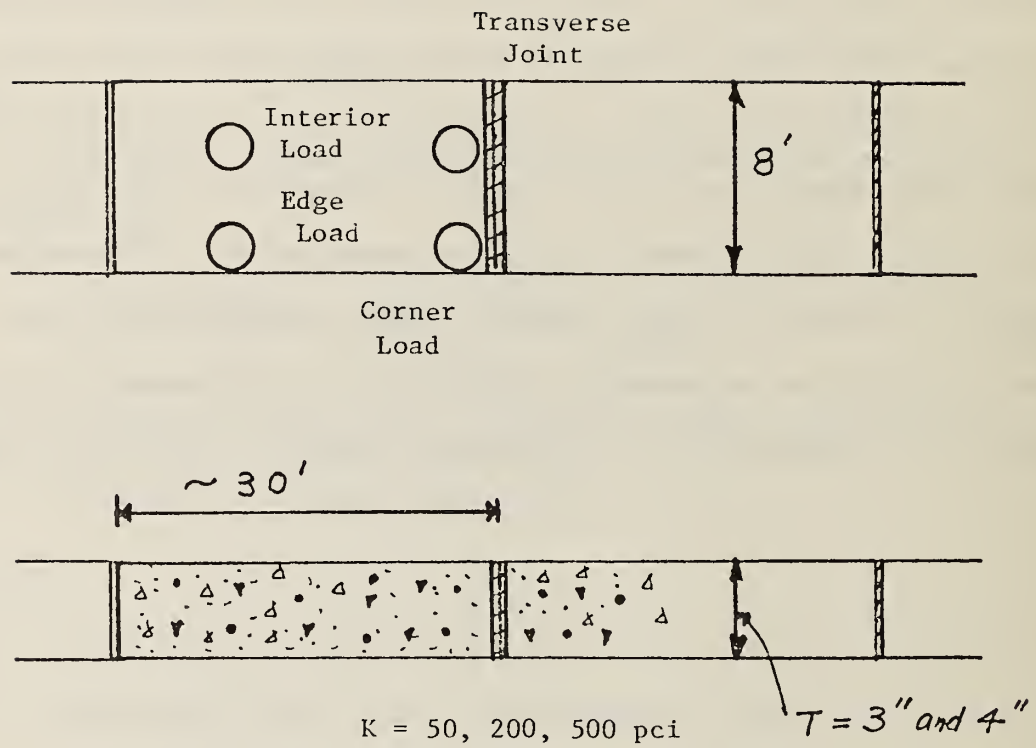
Position of Wheel Loads on Jointed Portland Cement Concrete Pavement.
